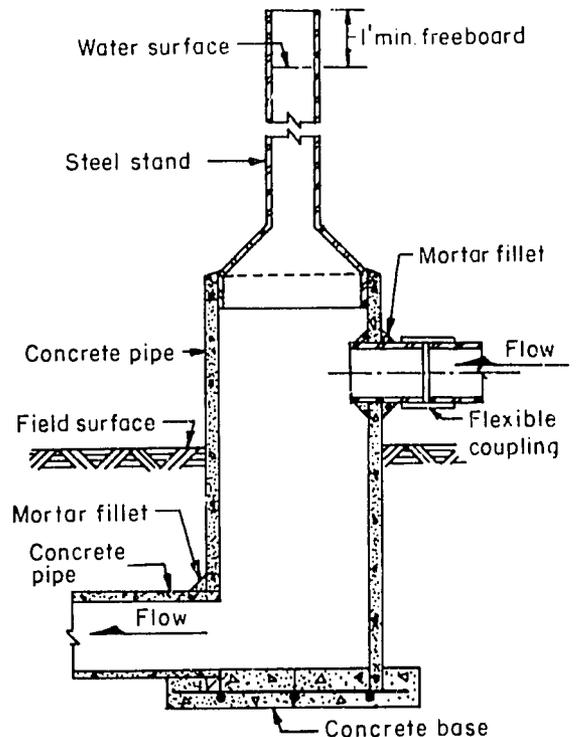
Detailed section of a high-head tapered pump stand similar to that shown in Fig. 4.
